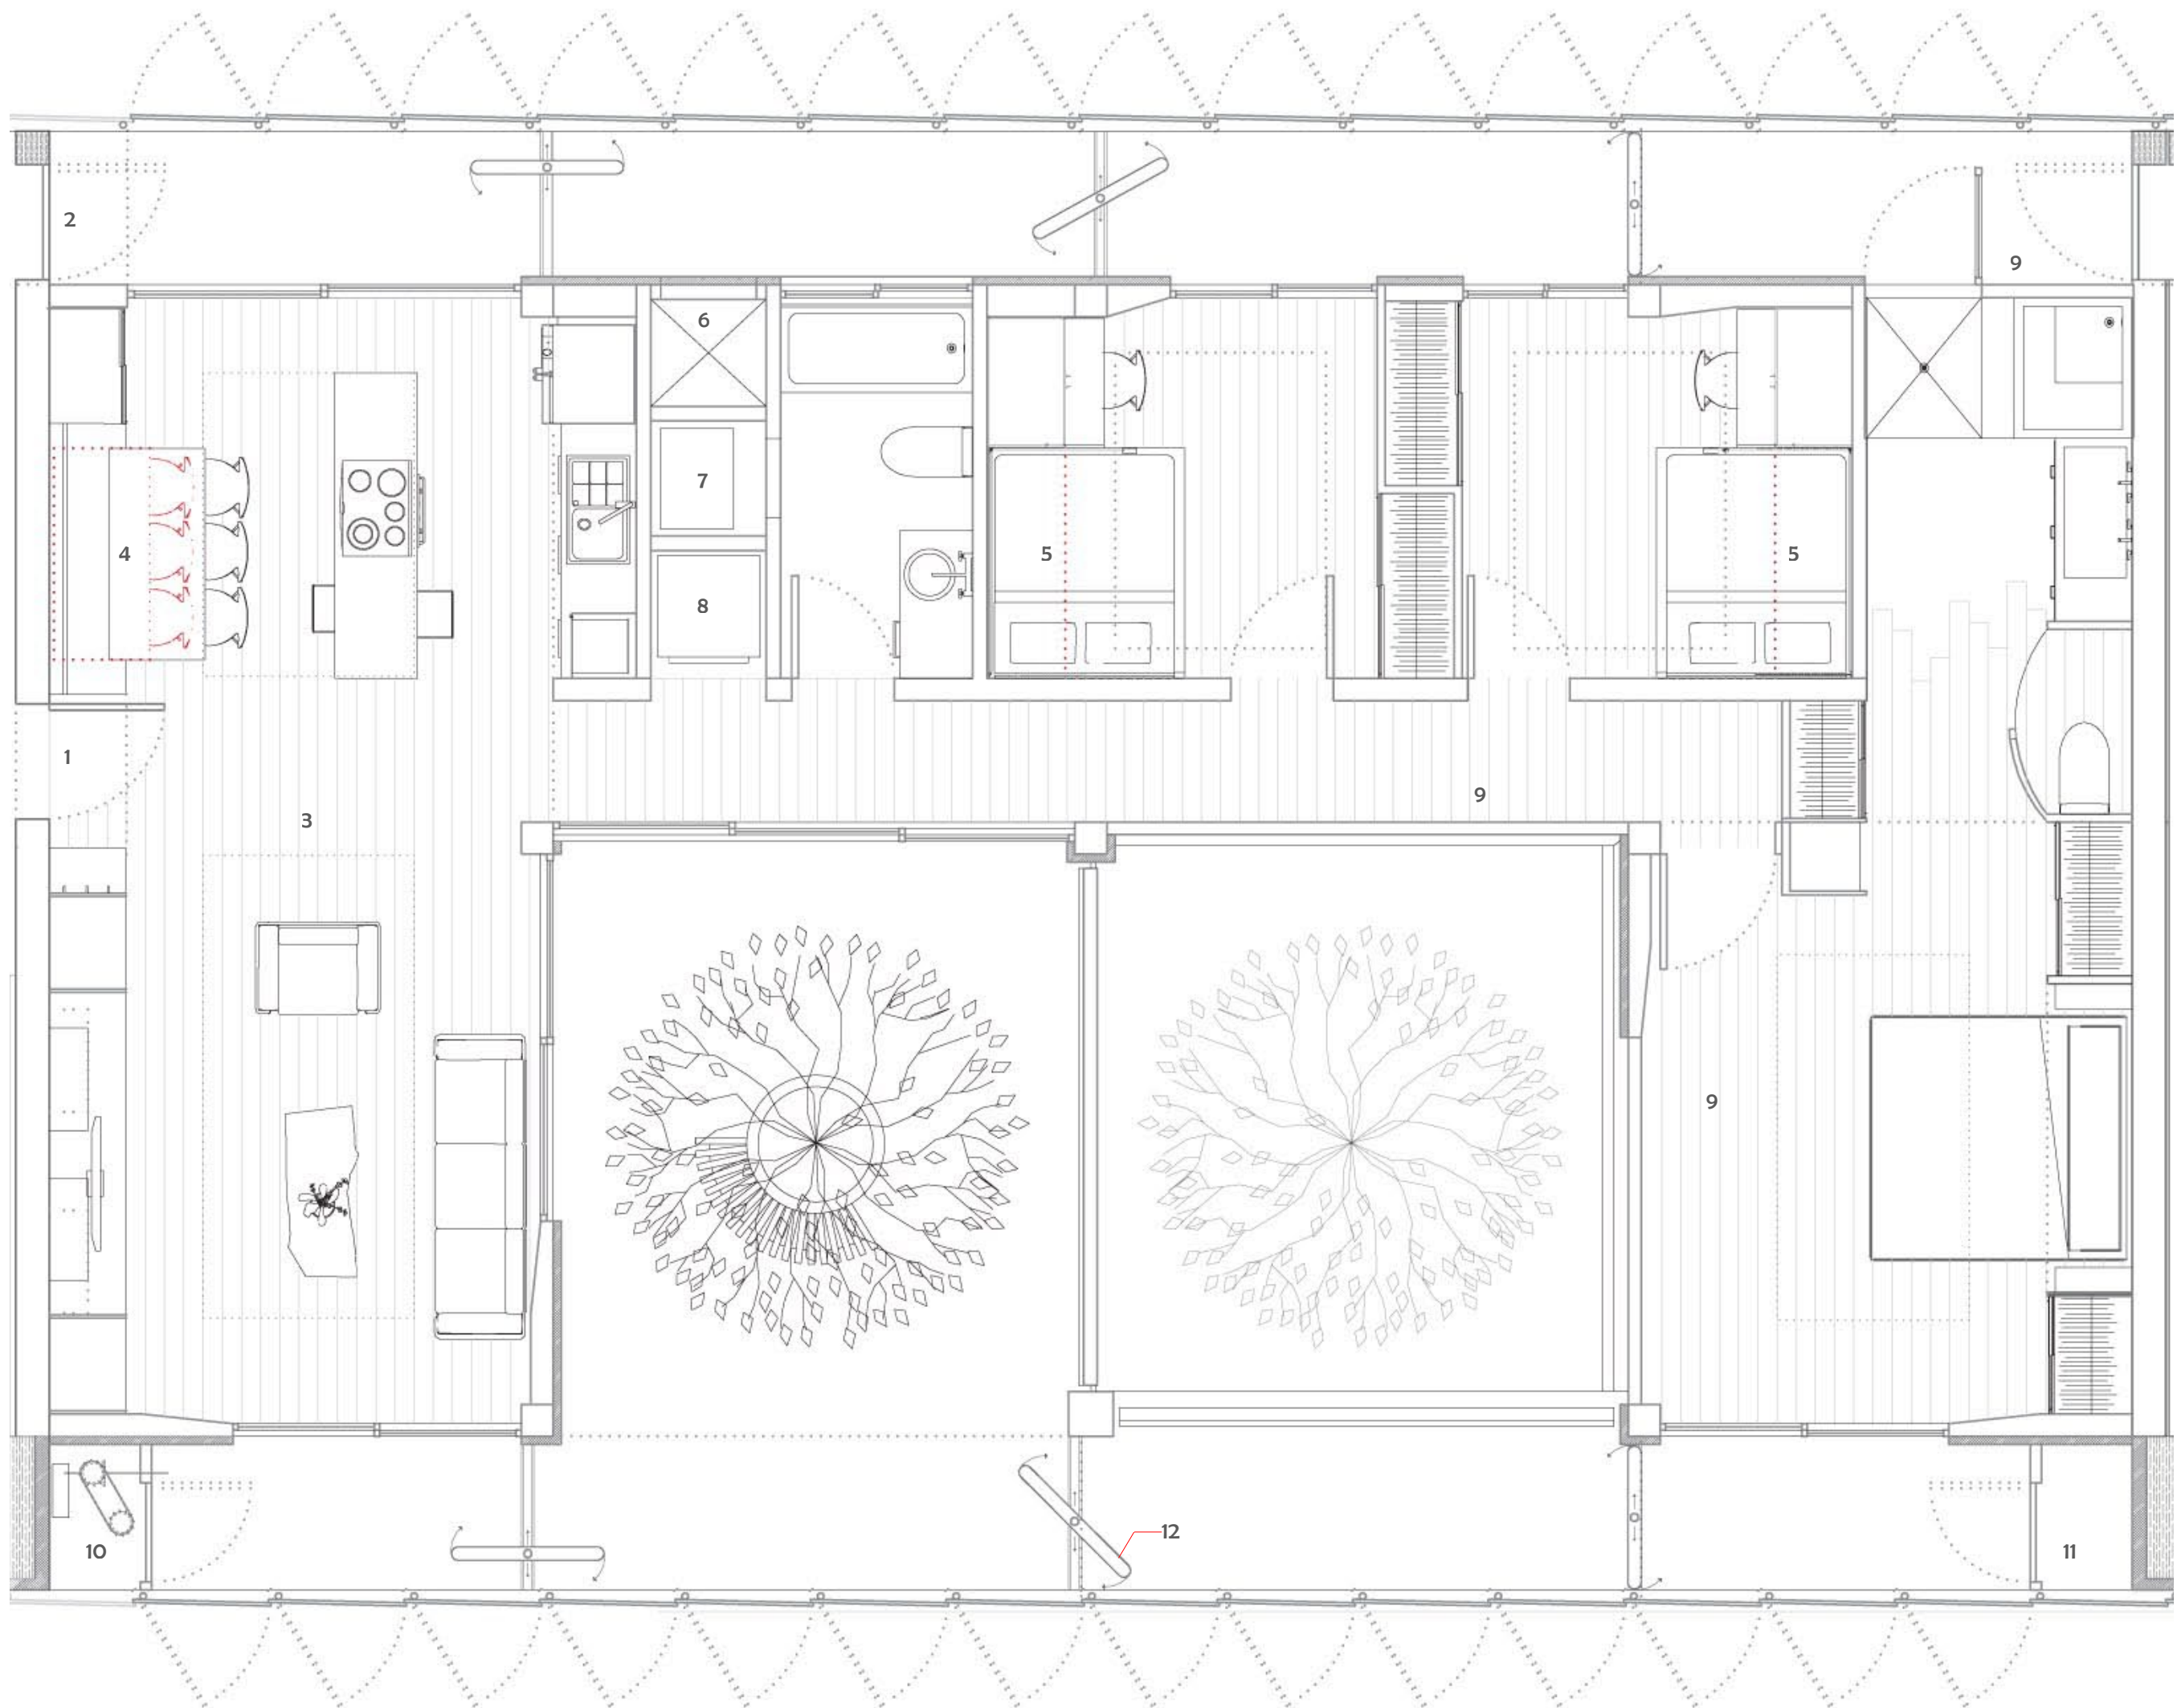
1/4"=1' typical plan of a three bedroom unit.
